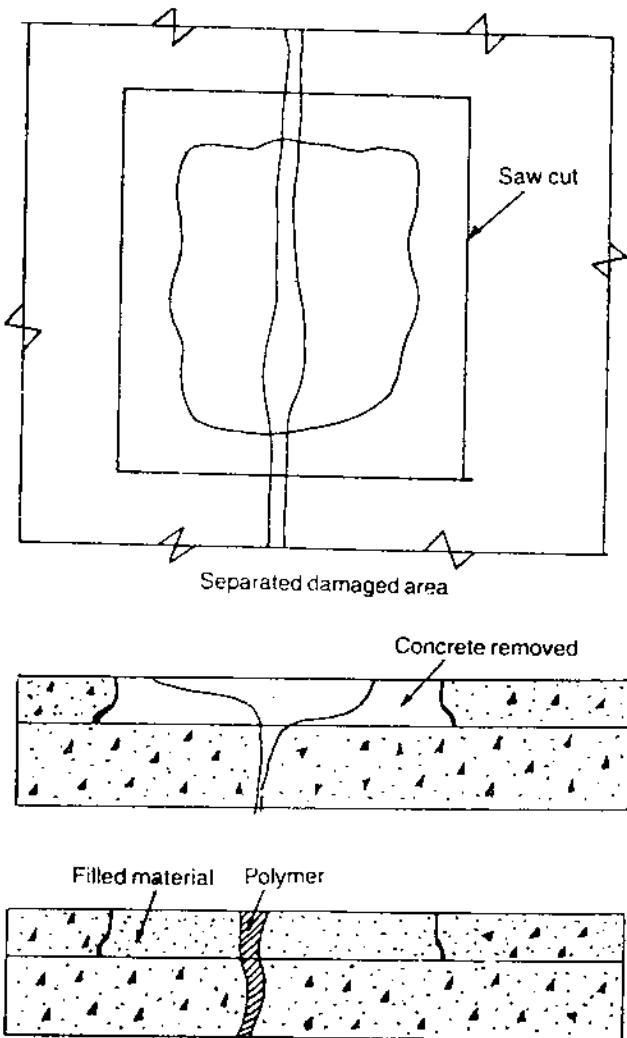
Repair of damaged area of a concrete slab
